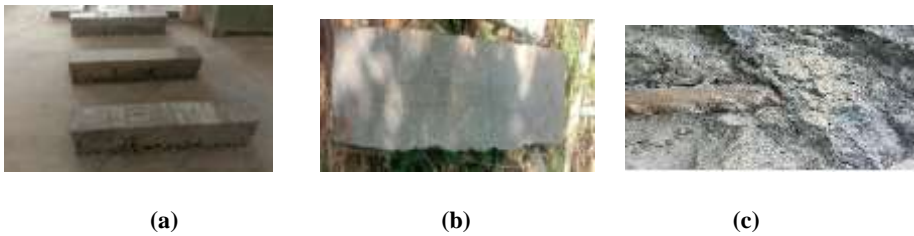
Bacterial concrete beams before and after 365 days of immersion in sea water
